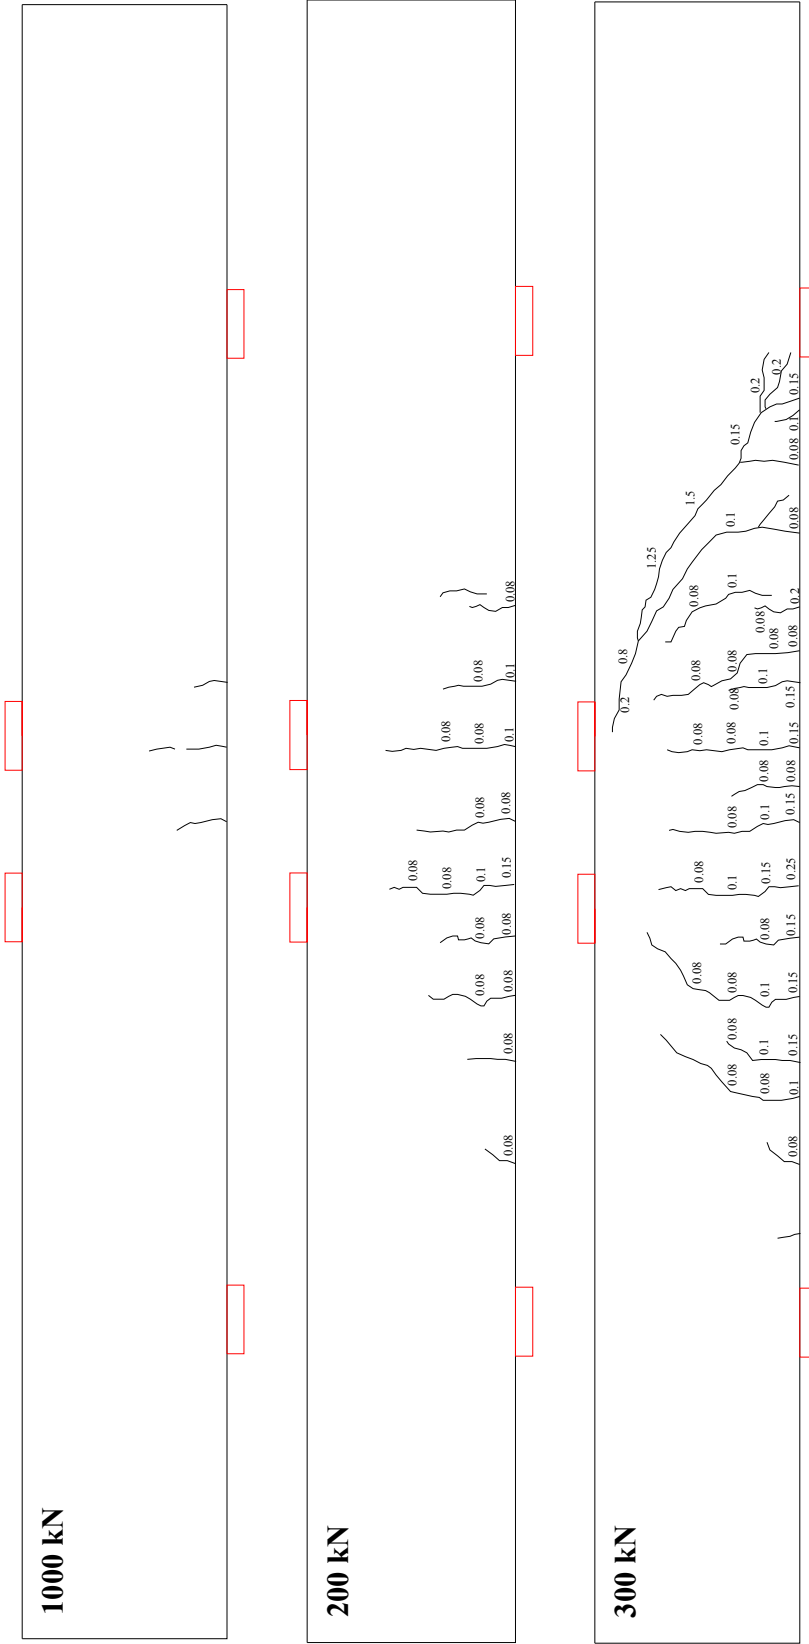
Crack patterns at different loading stages of specimen MW3-2
